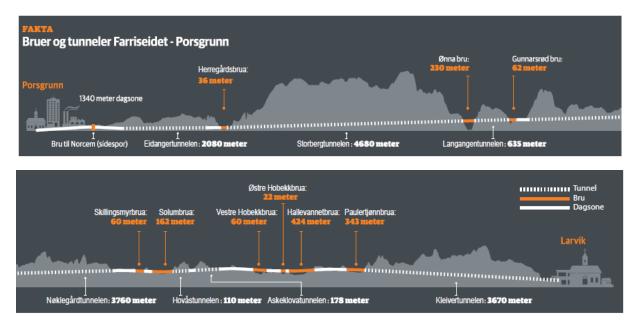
Length profile Farriseidet - Porsgrunn with tunnels, bridges and earthworks
